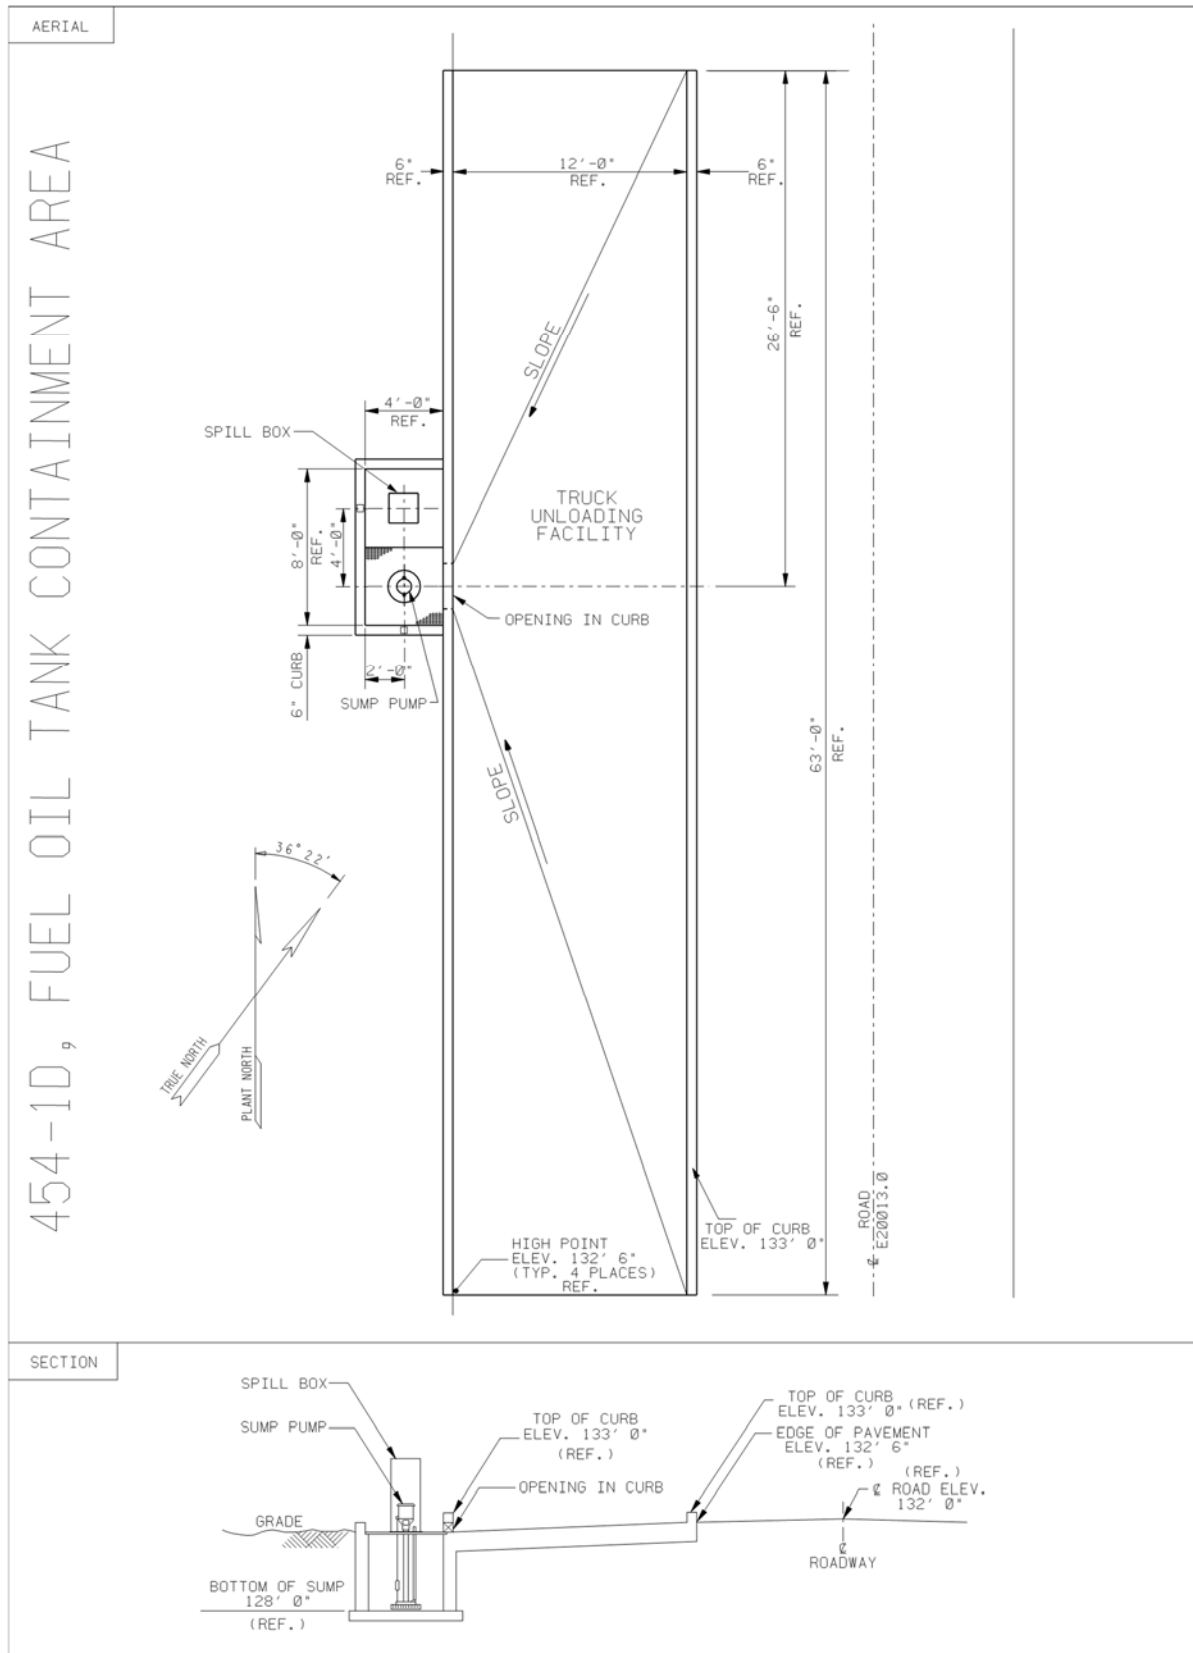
Building 454-D, D-Area Diesel Fuel Tank Layout (Plan View)
